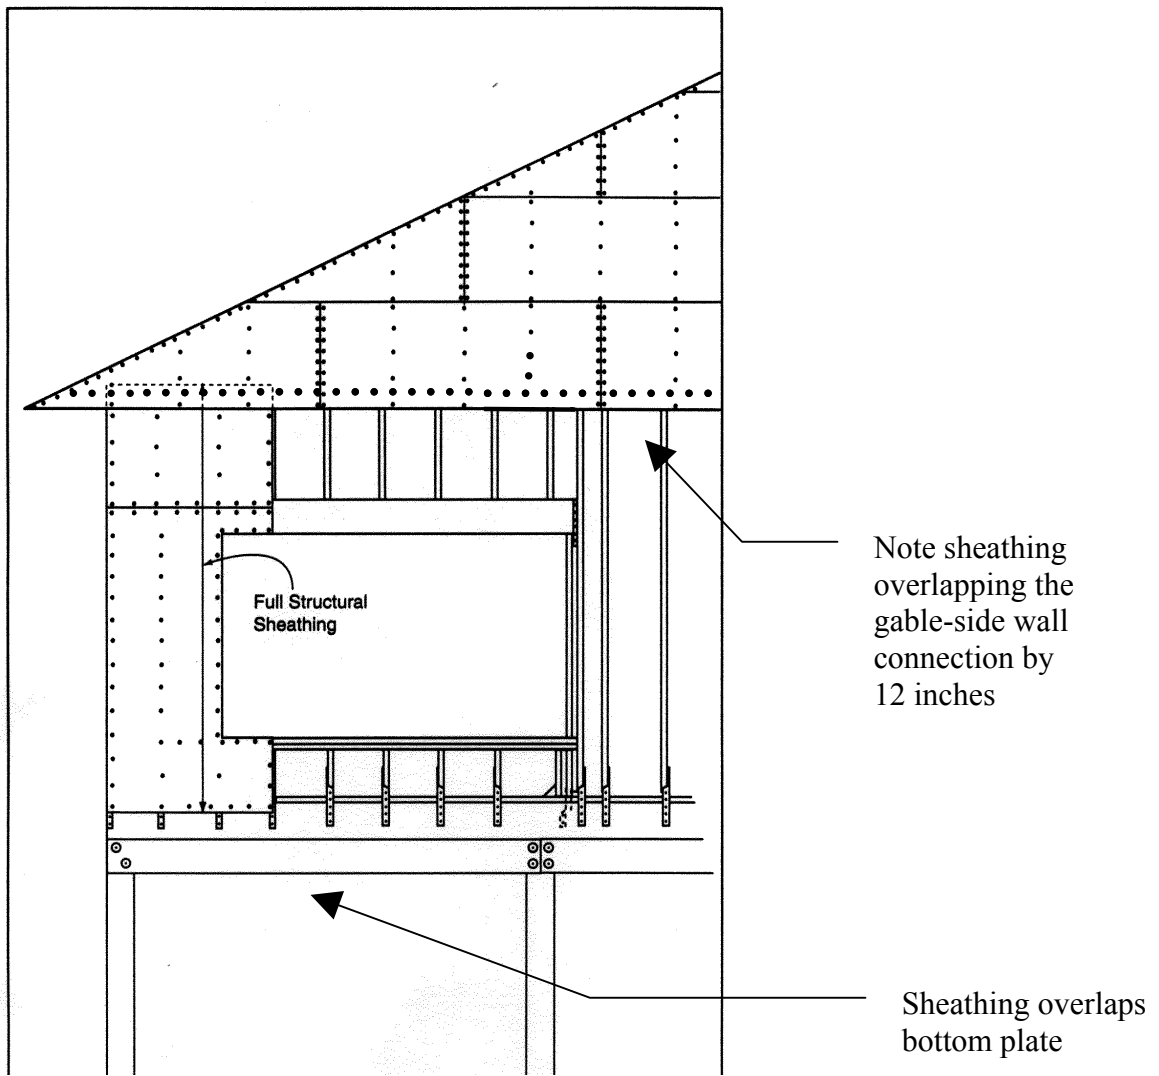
Example of how wall sheathing should overlap the gable wall-side wall connection.
